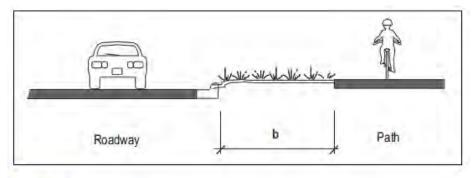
; Path Separation from Roadway with Curb (See Table 5-2)
